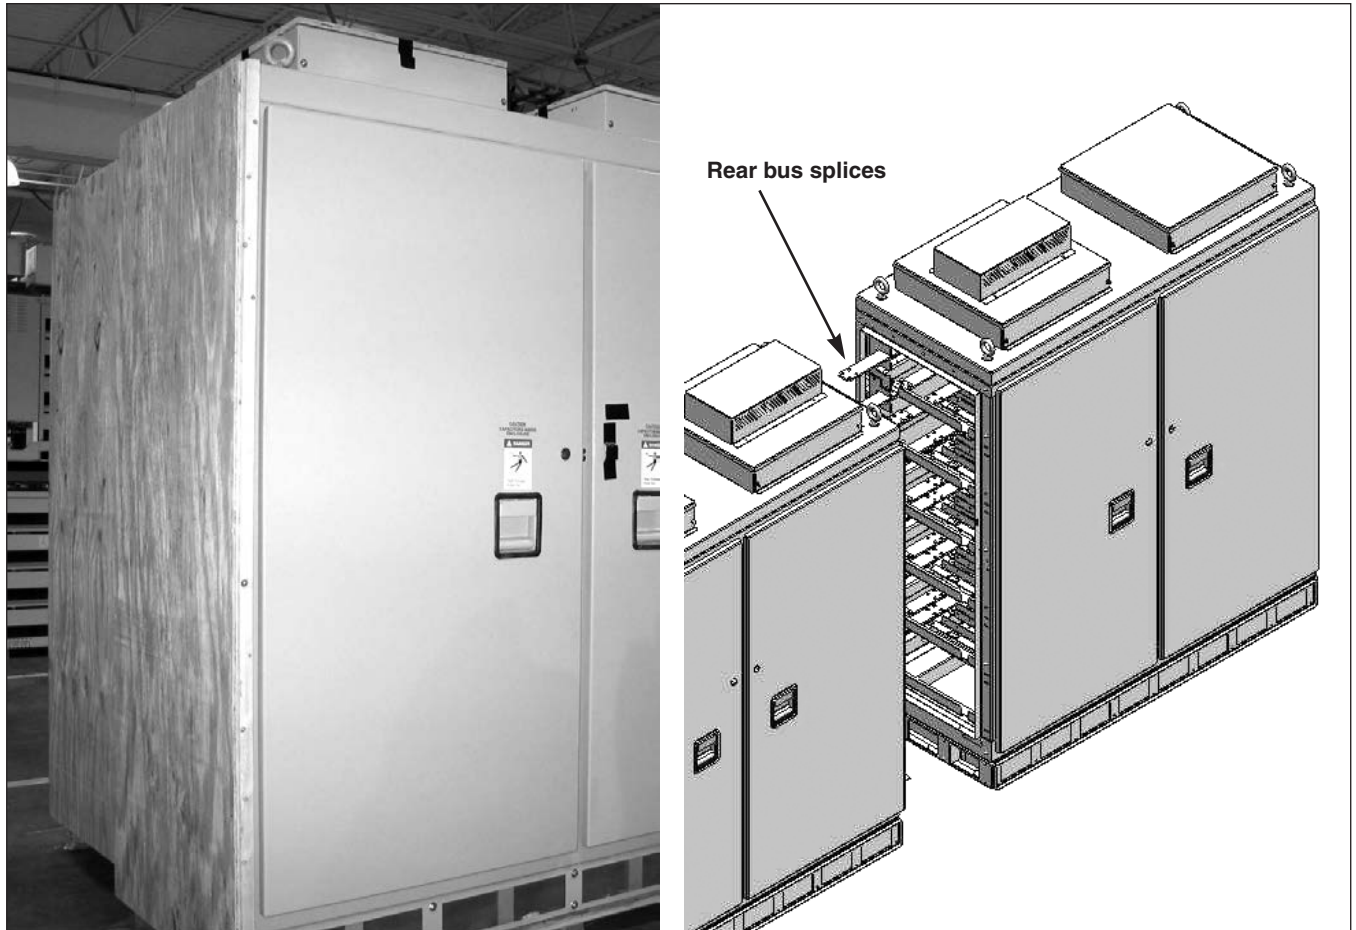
Individual section with wood panel at end. Sections are joined as shown.
